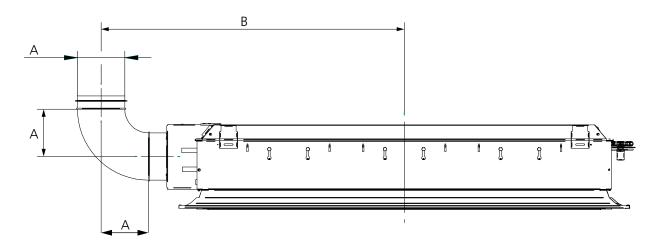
Dimensional drawing, short side connection with bend Ø125/160/200
